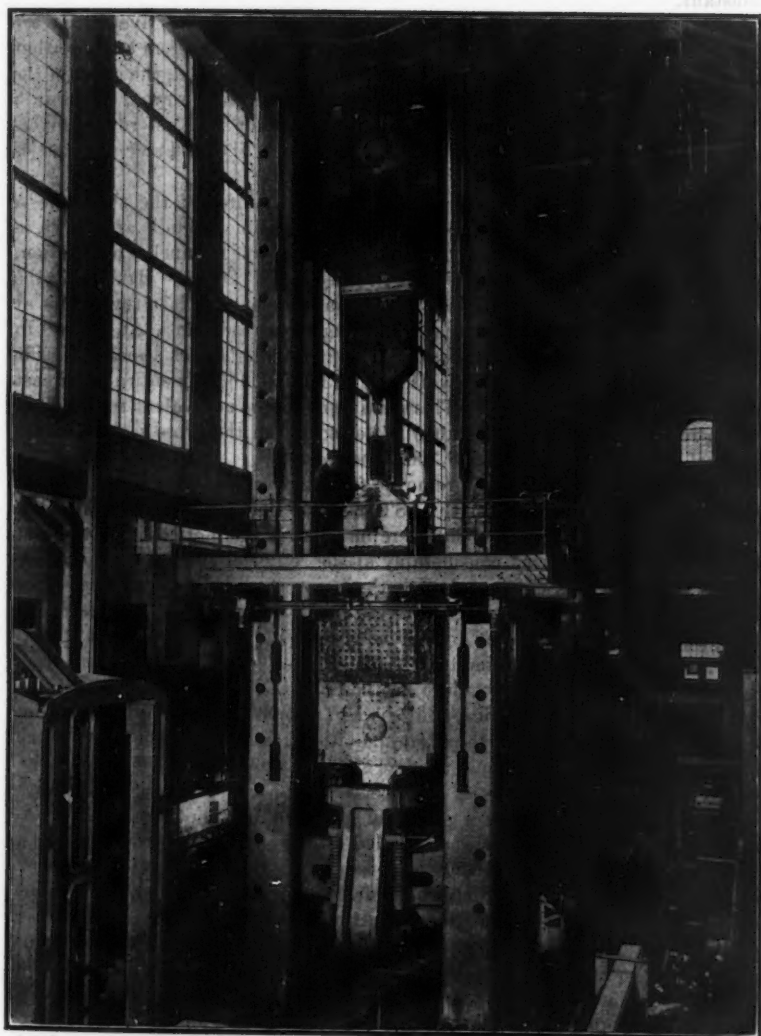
SPECIMEN ED2 IN 3,000,000-LB. TESTING MACHINE
